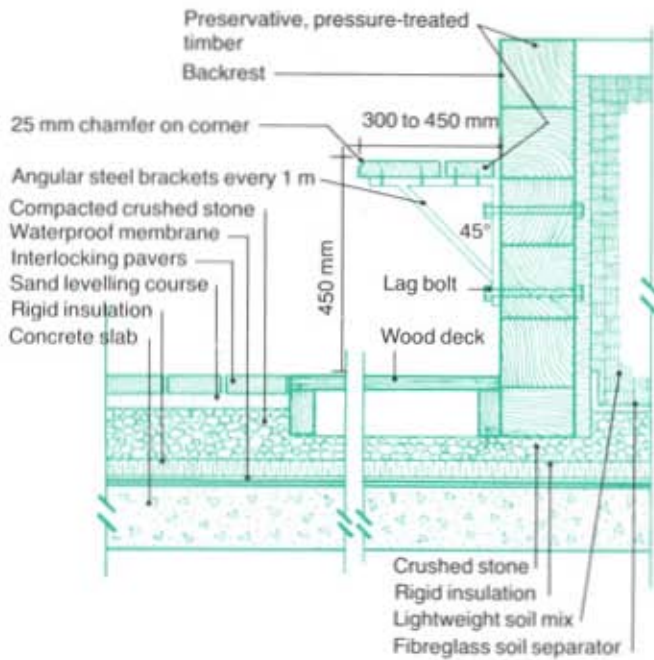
Typical construction detail of a combination wood bench and wood planter on a roof deck.
